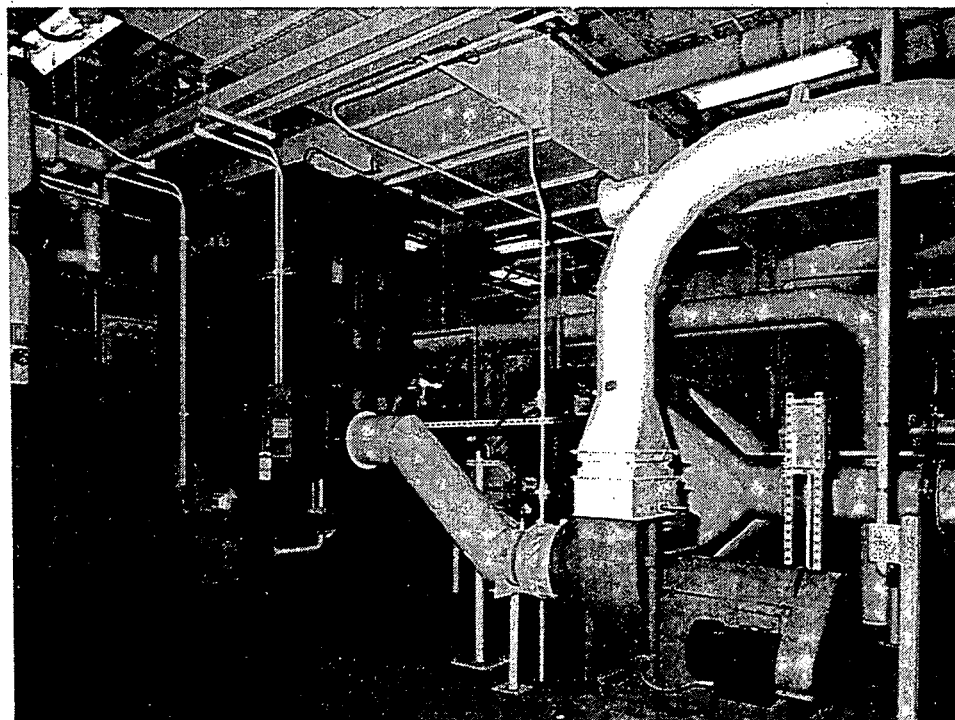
Building 78 - Second Floor, Process Equipment
